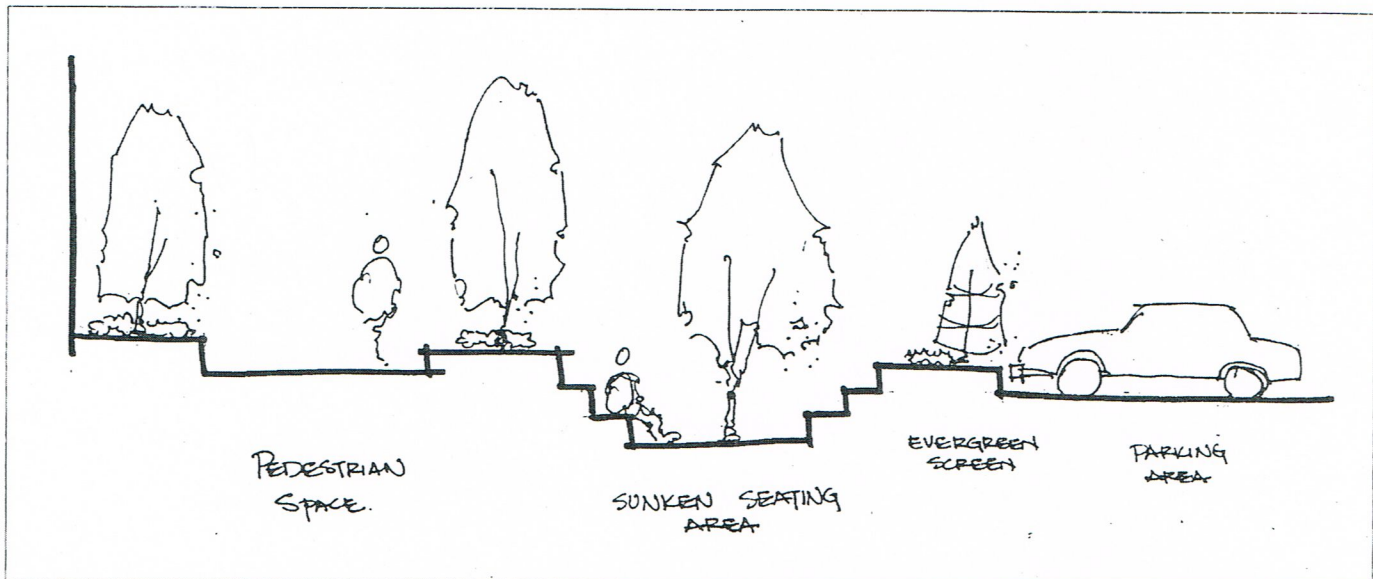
C: Cross section illustration of South Street showing the improved streetscape elements, seating area and pedestrian spaces which could be included in the proposed outdoor courtyards next to the Town Hall parking lot or the area across South Street (shown on the other figures).
